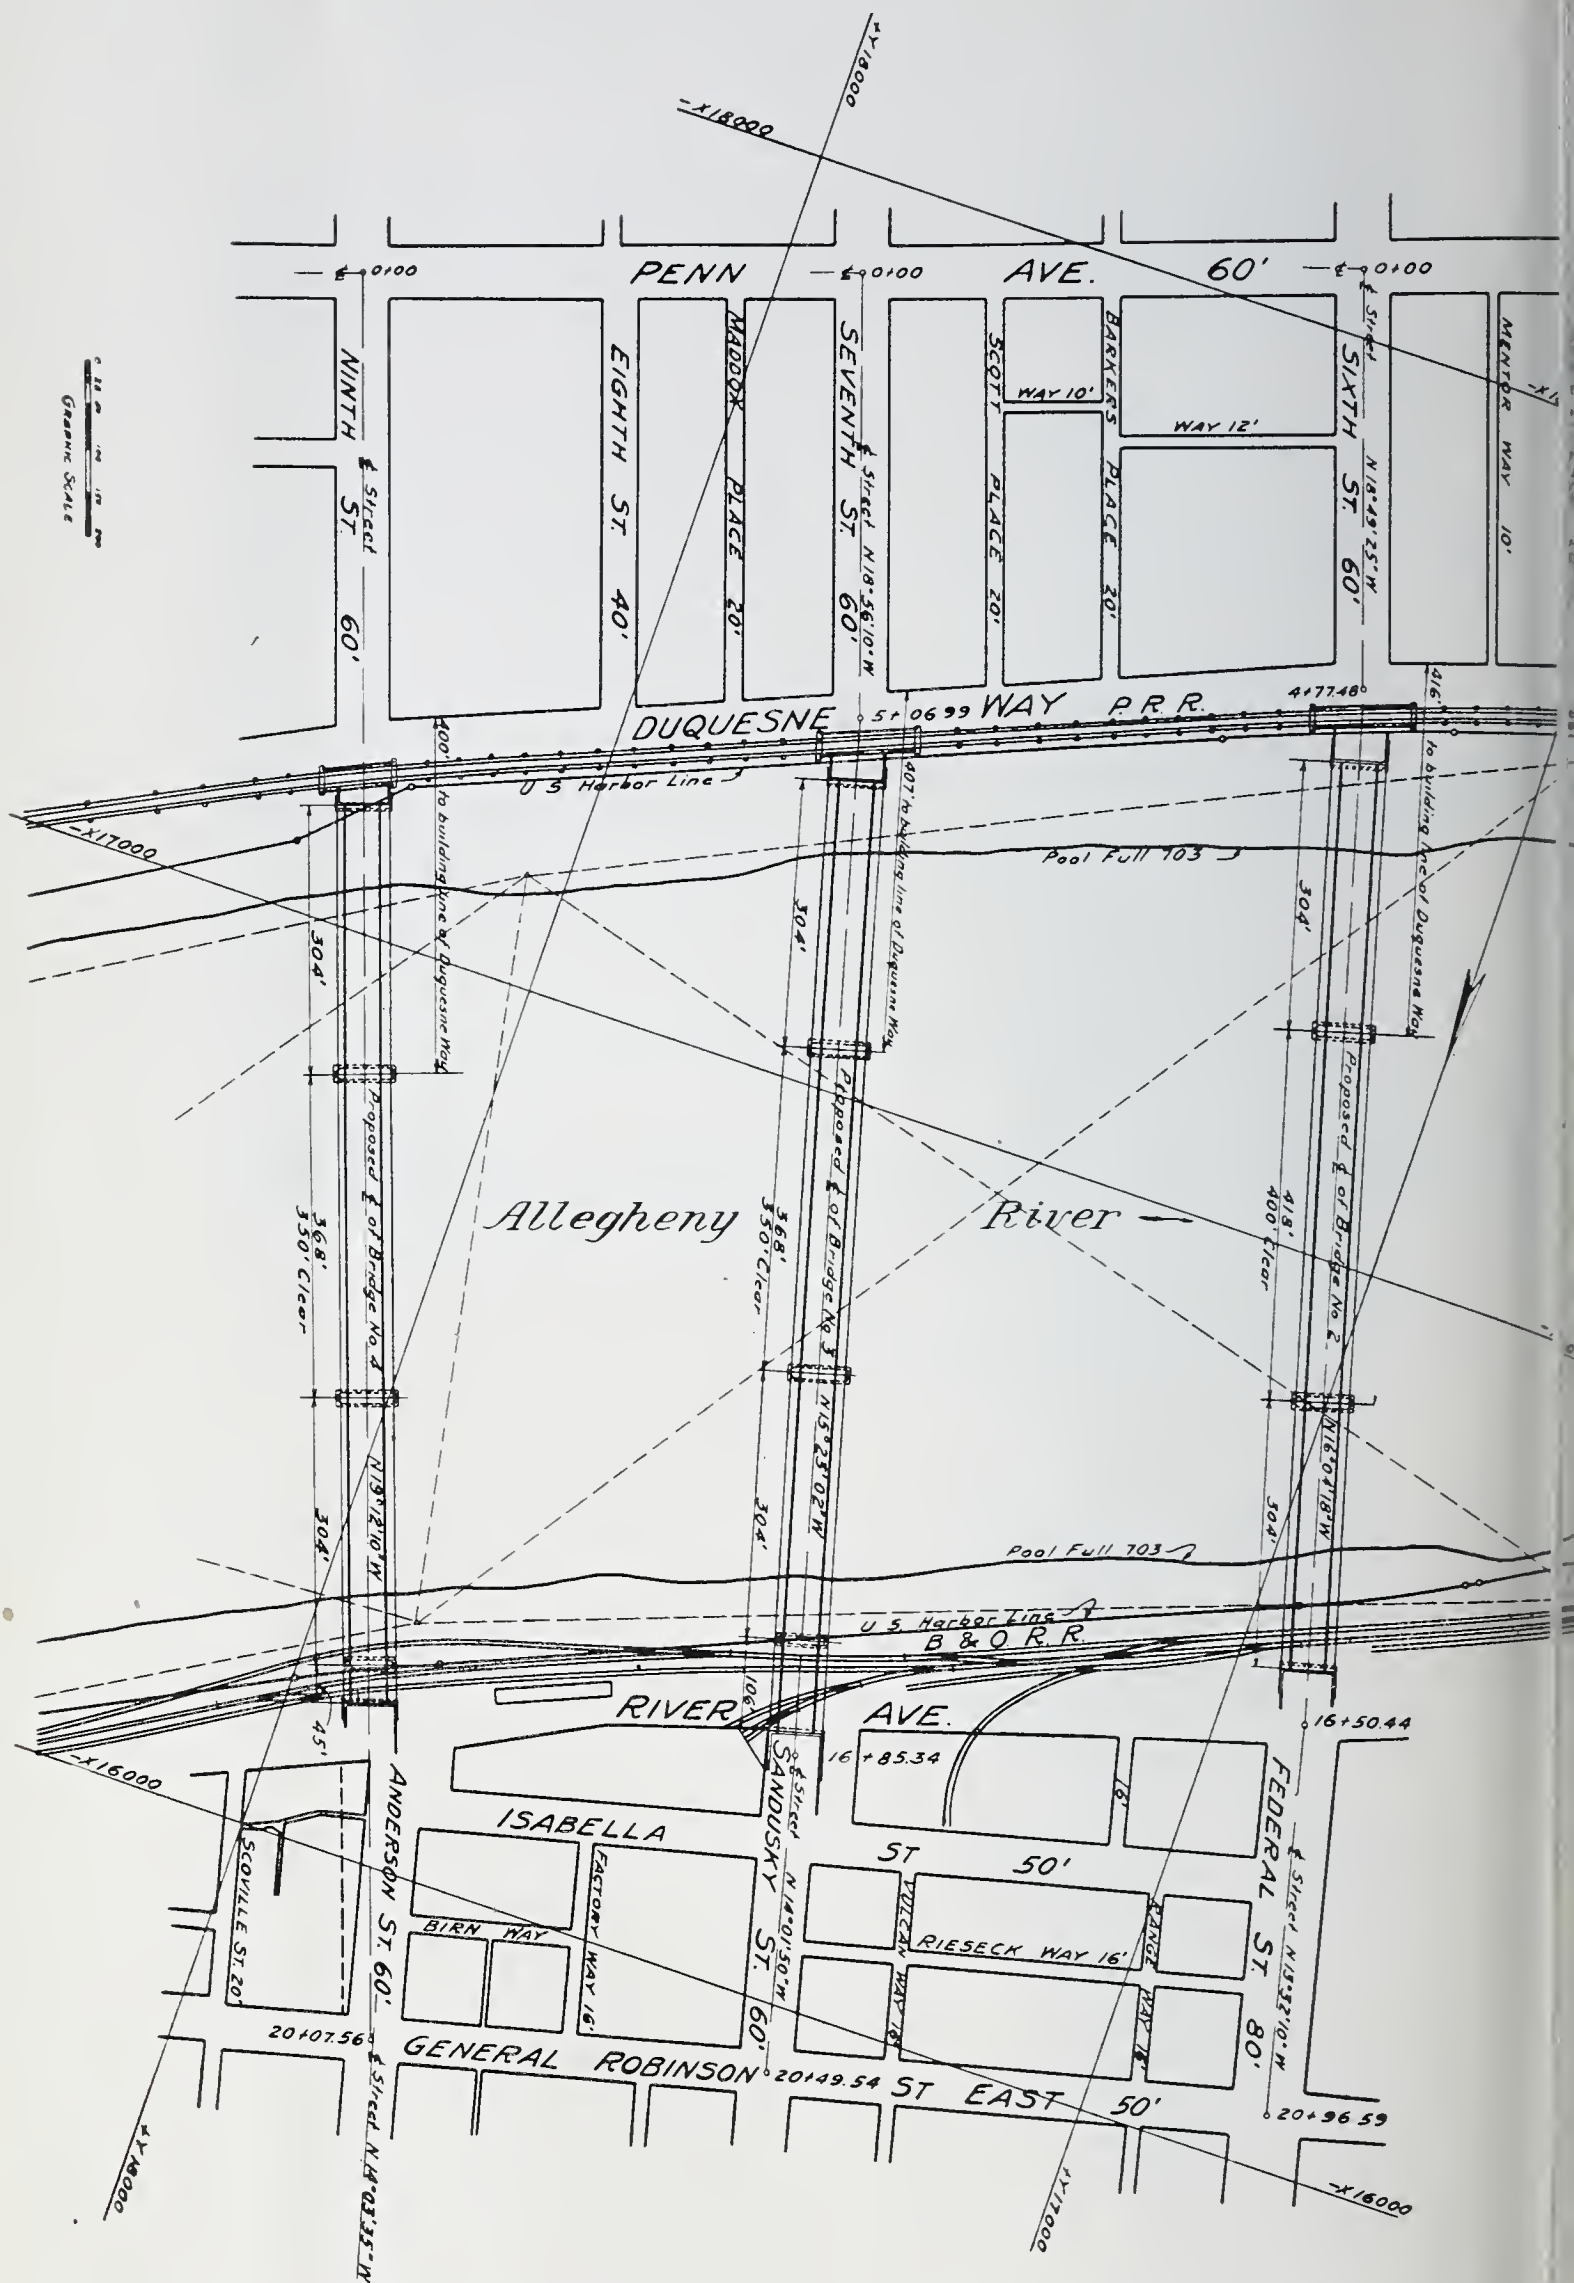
Proposed Piers and Abutments Located in Compliance with Order of War Department.
